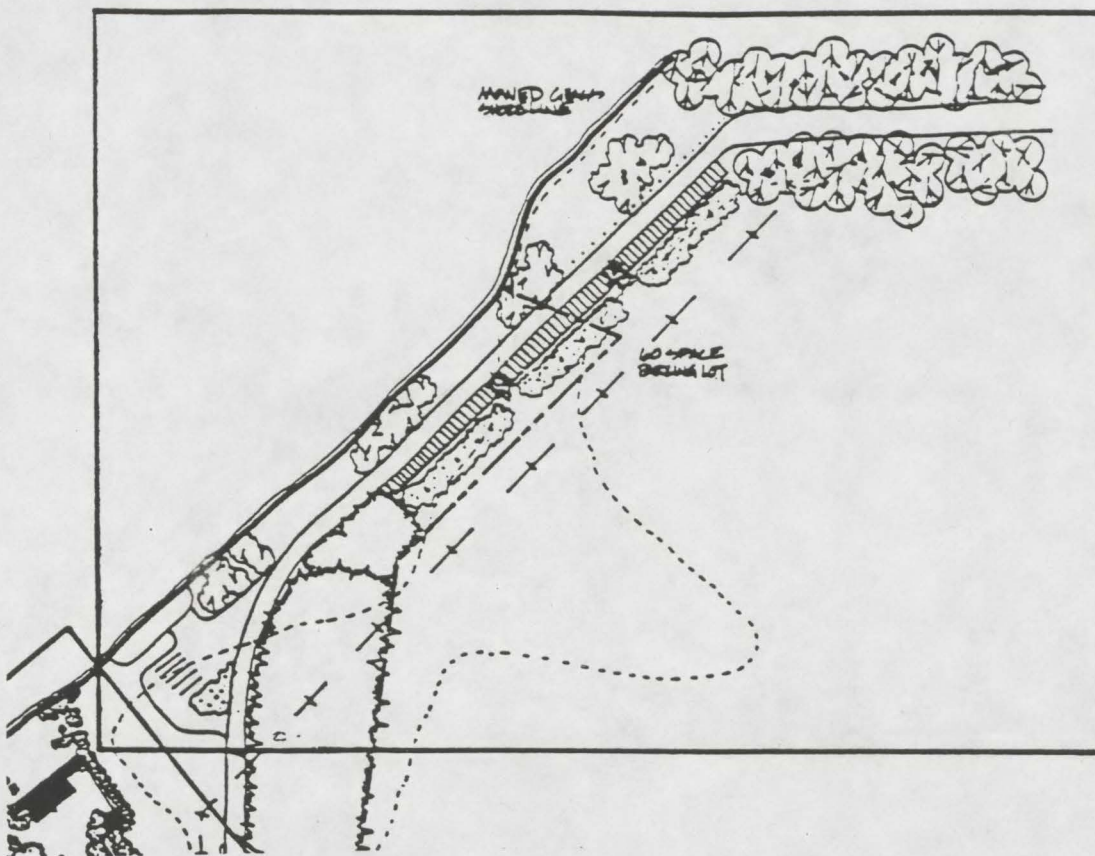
Arrowhead Point Park Entry Proposal Plan.
